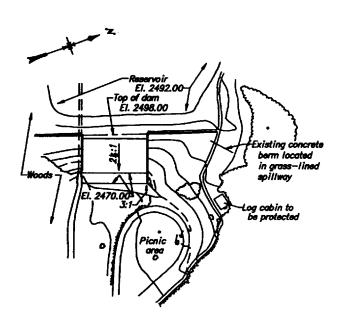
General plan of the block spillway layout on the 8-meter- (27-foot-) high embankment dam with 2.5:1 downstream slope.
